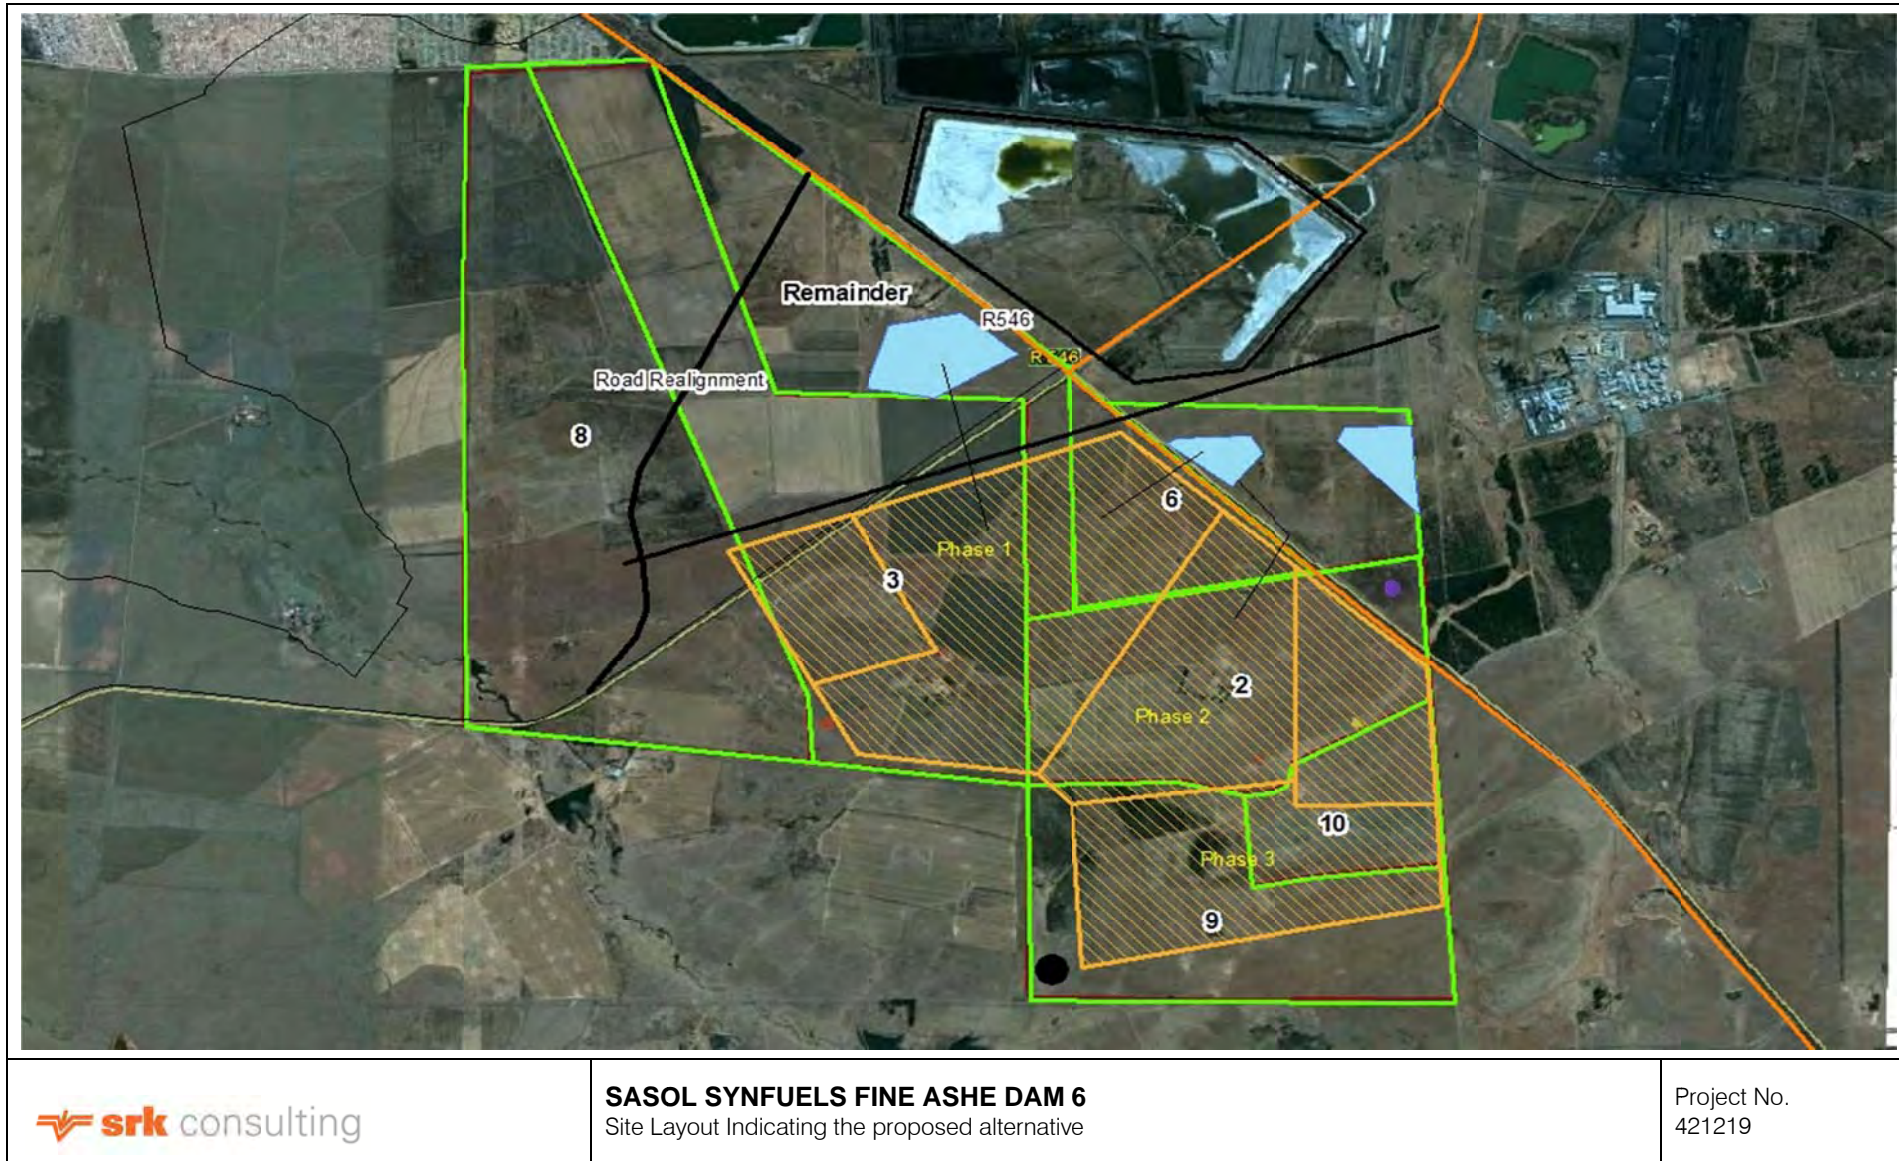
Site layout of the proposed FAD 6, indicating the proposed alternative
